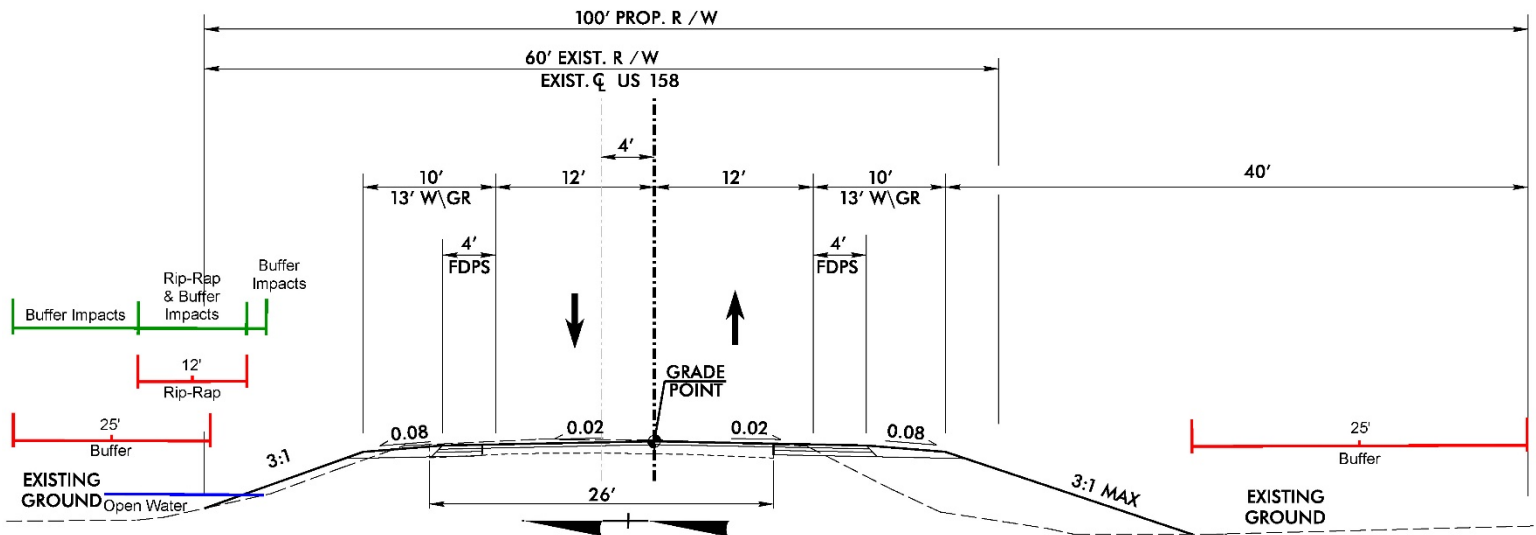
Alternative 3 Proposed Typical Section Adjacent to the Refuge
